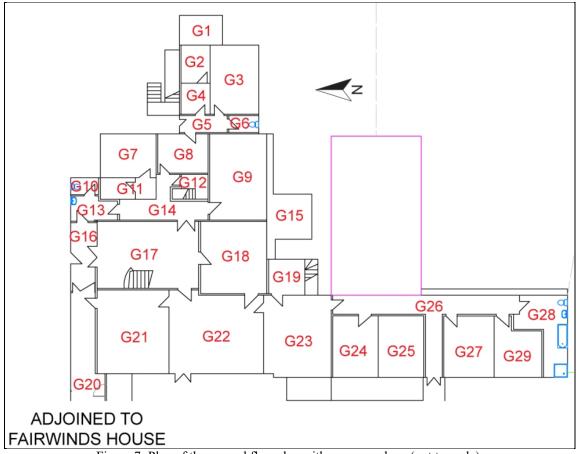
Plan of the ground floorplan with room numbers (not to scale).
